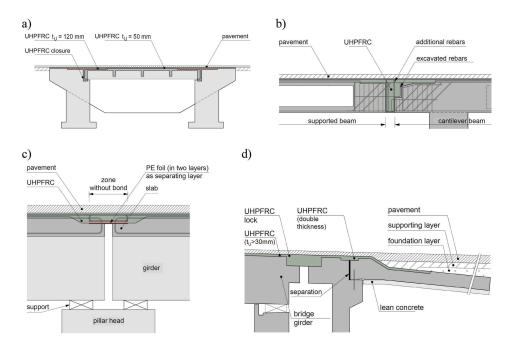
Principle of UHPFRC joint closure: a) in the abutment zones of a single span bridge to create a half-frame, b) force-locked Gerber joint, c) partial joint closure for beam chains, also called "link slab", and d) creation of a semi-integral bridge end.
